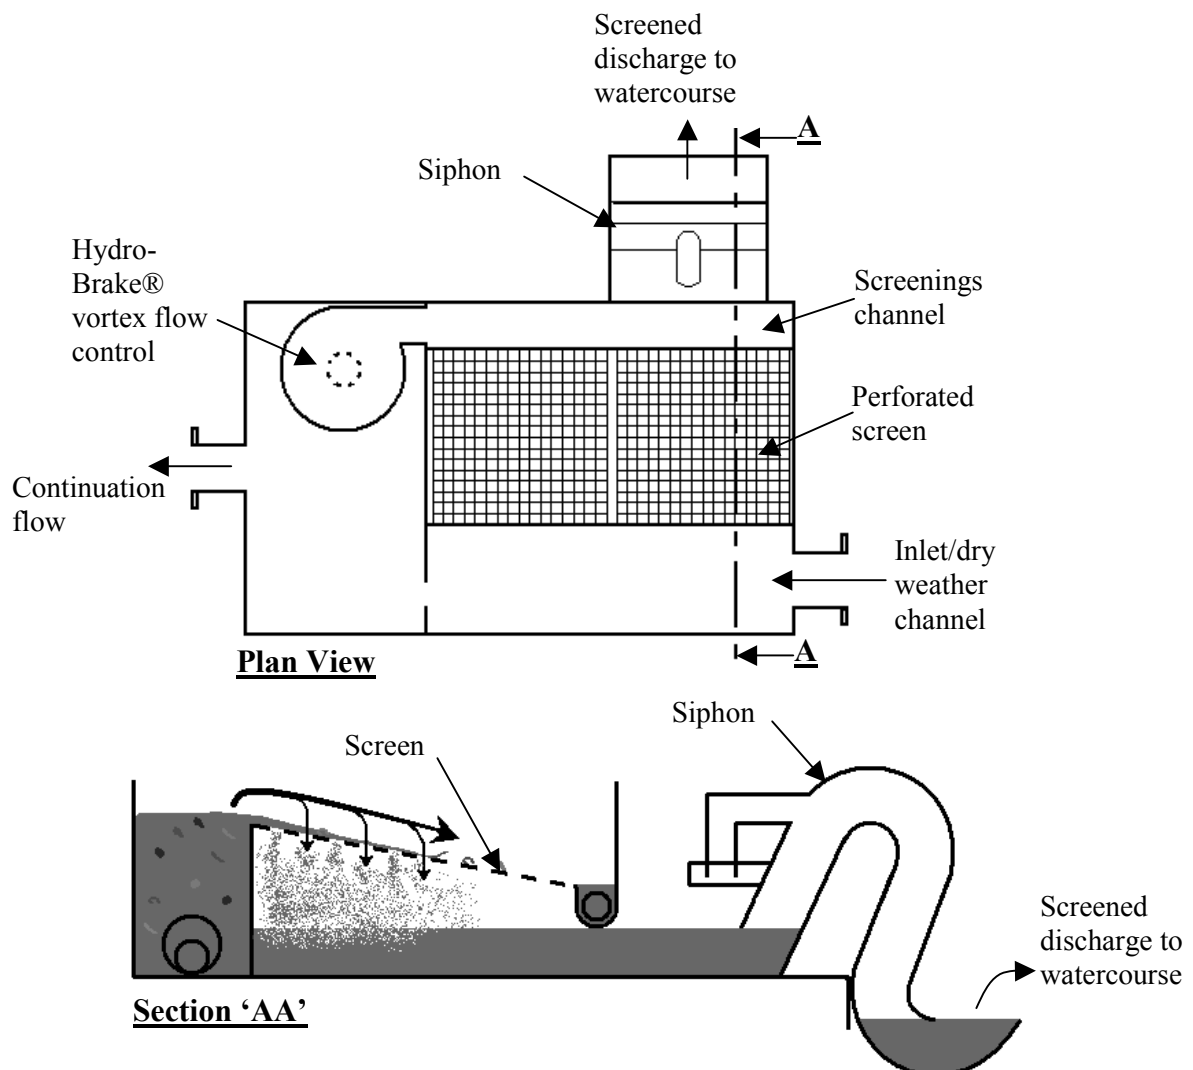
Plan and sectional views through the Hydro-Jet Screen™
